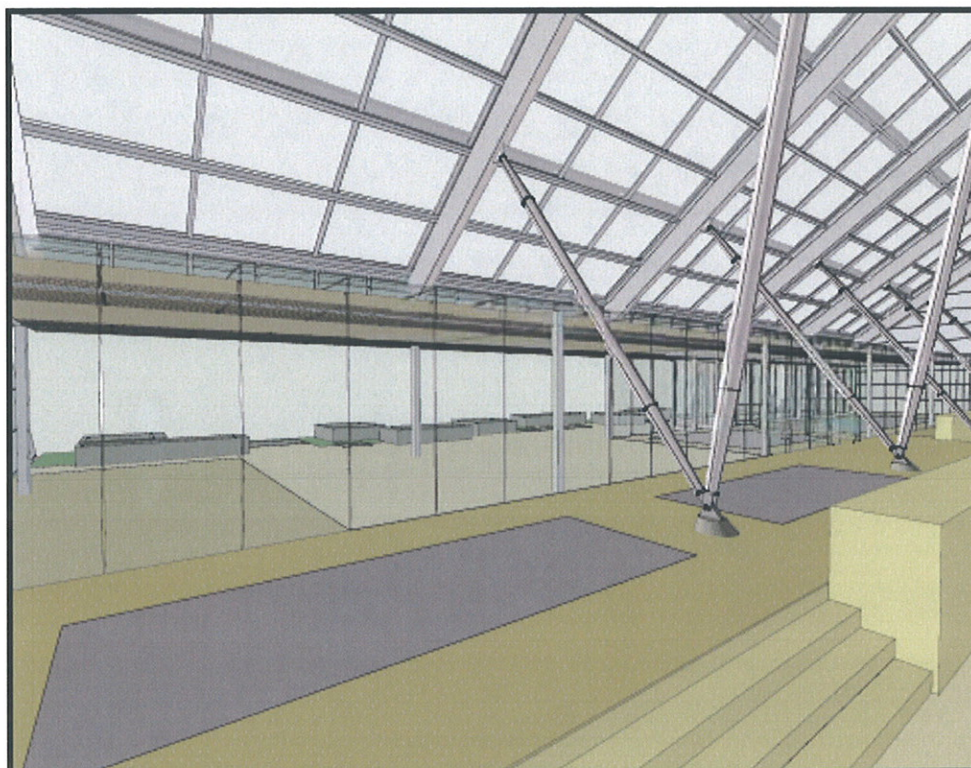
External Terrace and BBQ and Bar Area, Level 6
